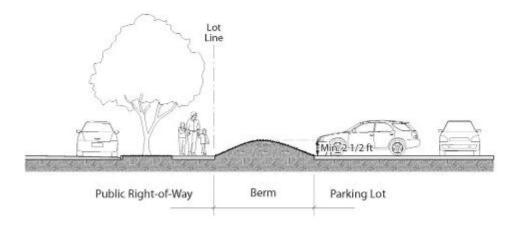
PERIMETER SETBACKS AND LANDSCAPING ABUTTING STREETS - METHOD A
